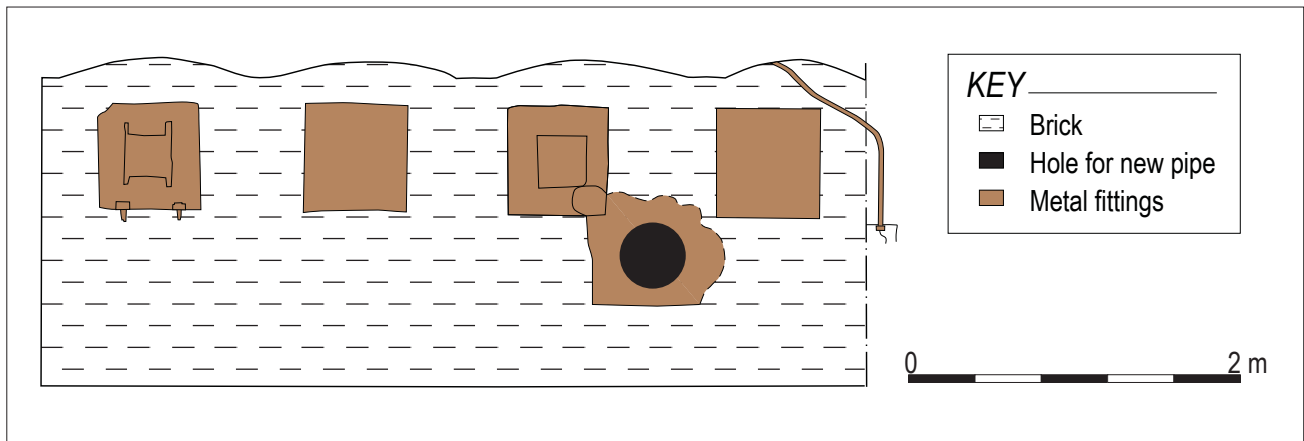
East facing elevation of the Mound, Crawley Tunnel
